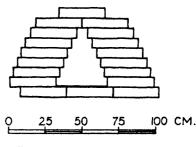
CROSS-SECTION OF BRICK DRAIN IN O 28:4. SCALE, 1:25
